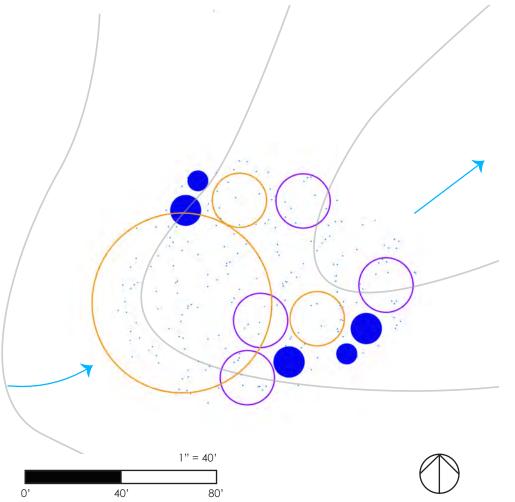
North Jardine Bioretention Site C Planting Plan and Palette.
